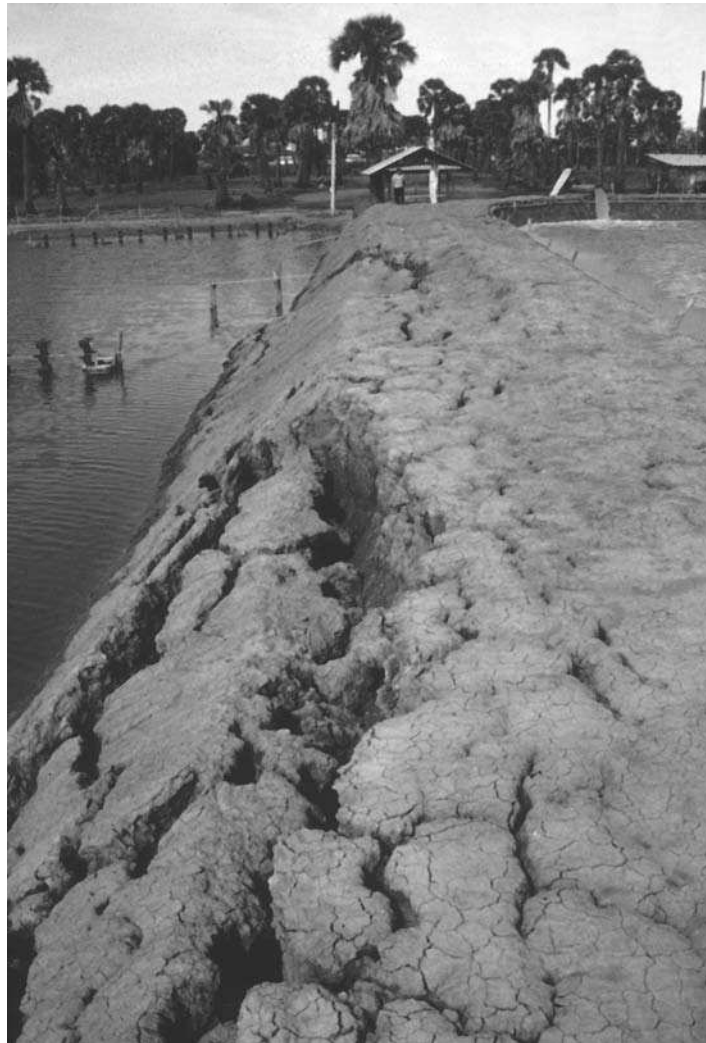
Embankments made of heavy clay soils must have adequate side slopes or they will slip. Also, cracks occur when embankments of heavy clay dry.
